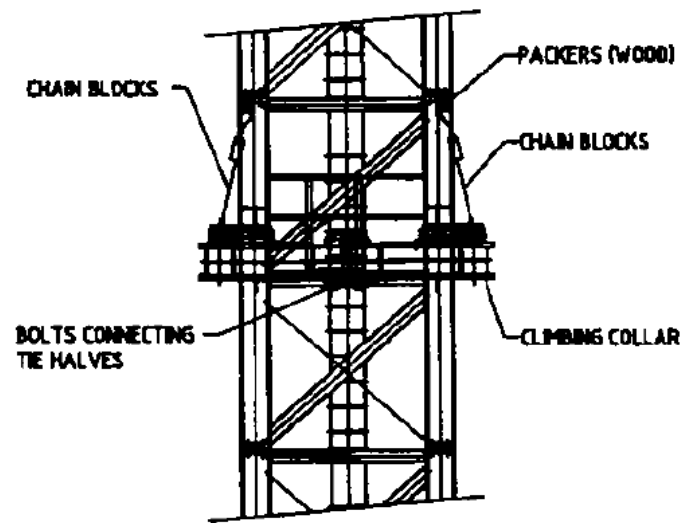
Favelle Favco External Climbing Procedure (source: Favelle Favco Tower Cranes Operating, Maintenance and Parts Manual for a Type M440D tower crane)
